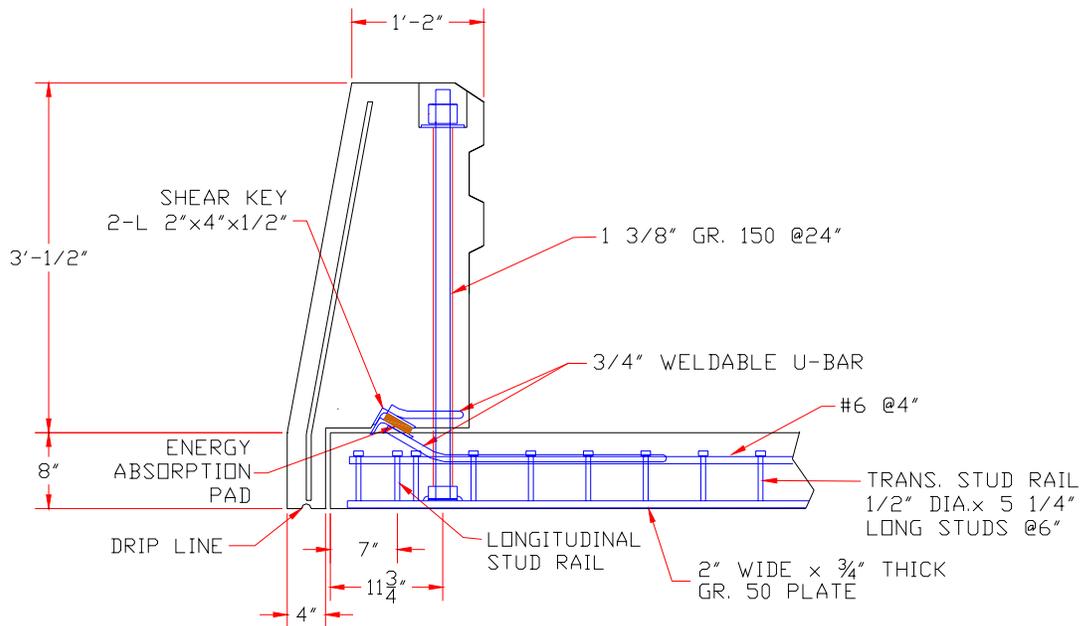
Flexure and shear reinforcement in the 176th & I-80 barrier system.
